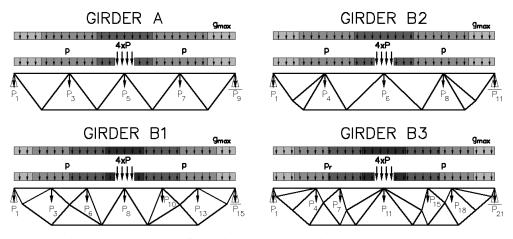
Standard way of applying load to truss girders A, B1, B2 and B3
